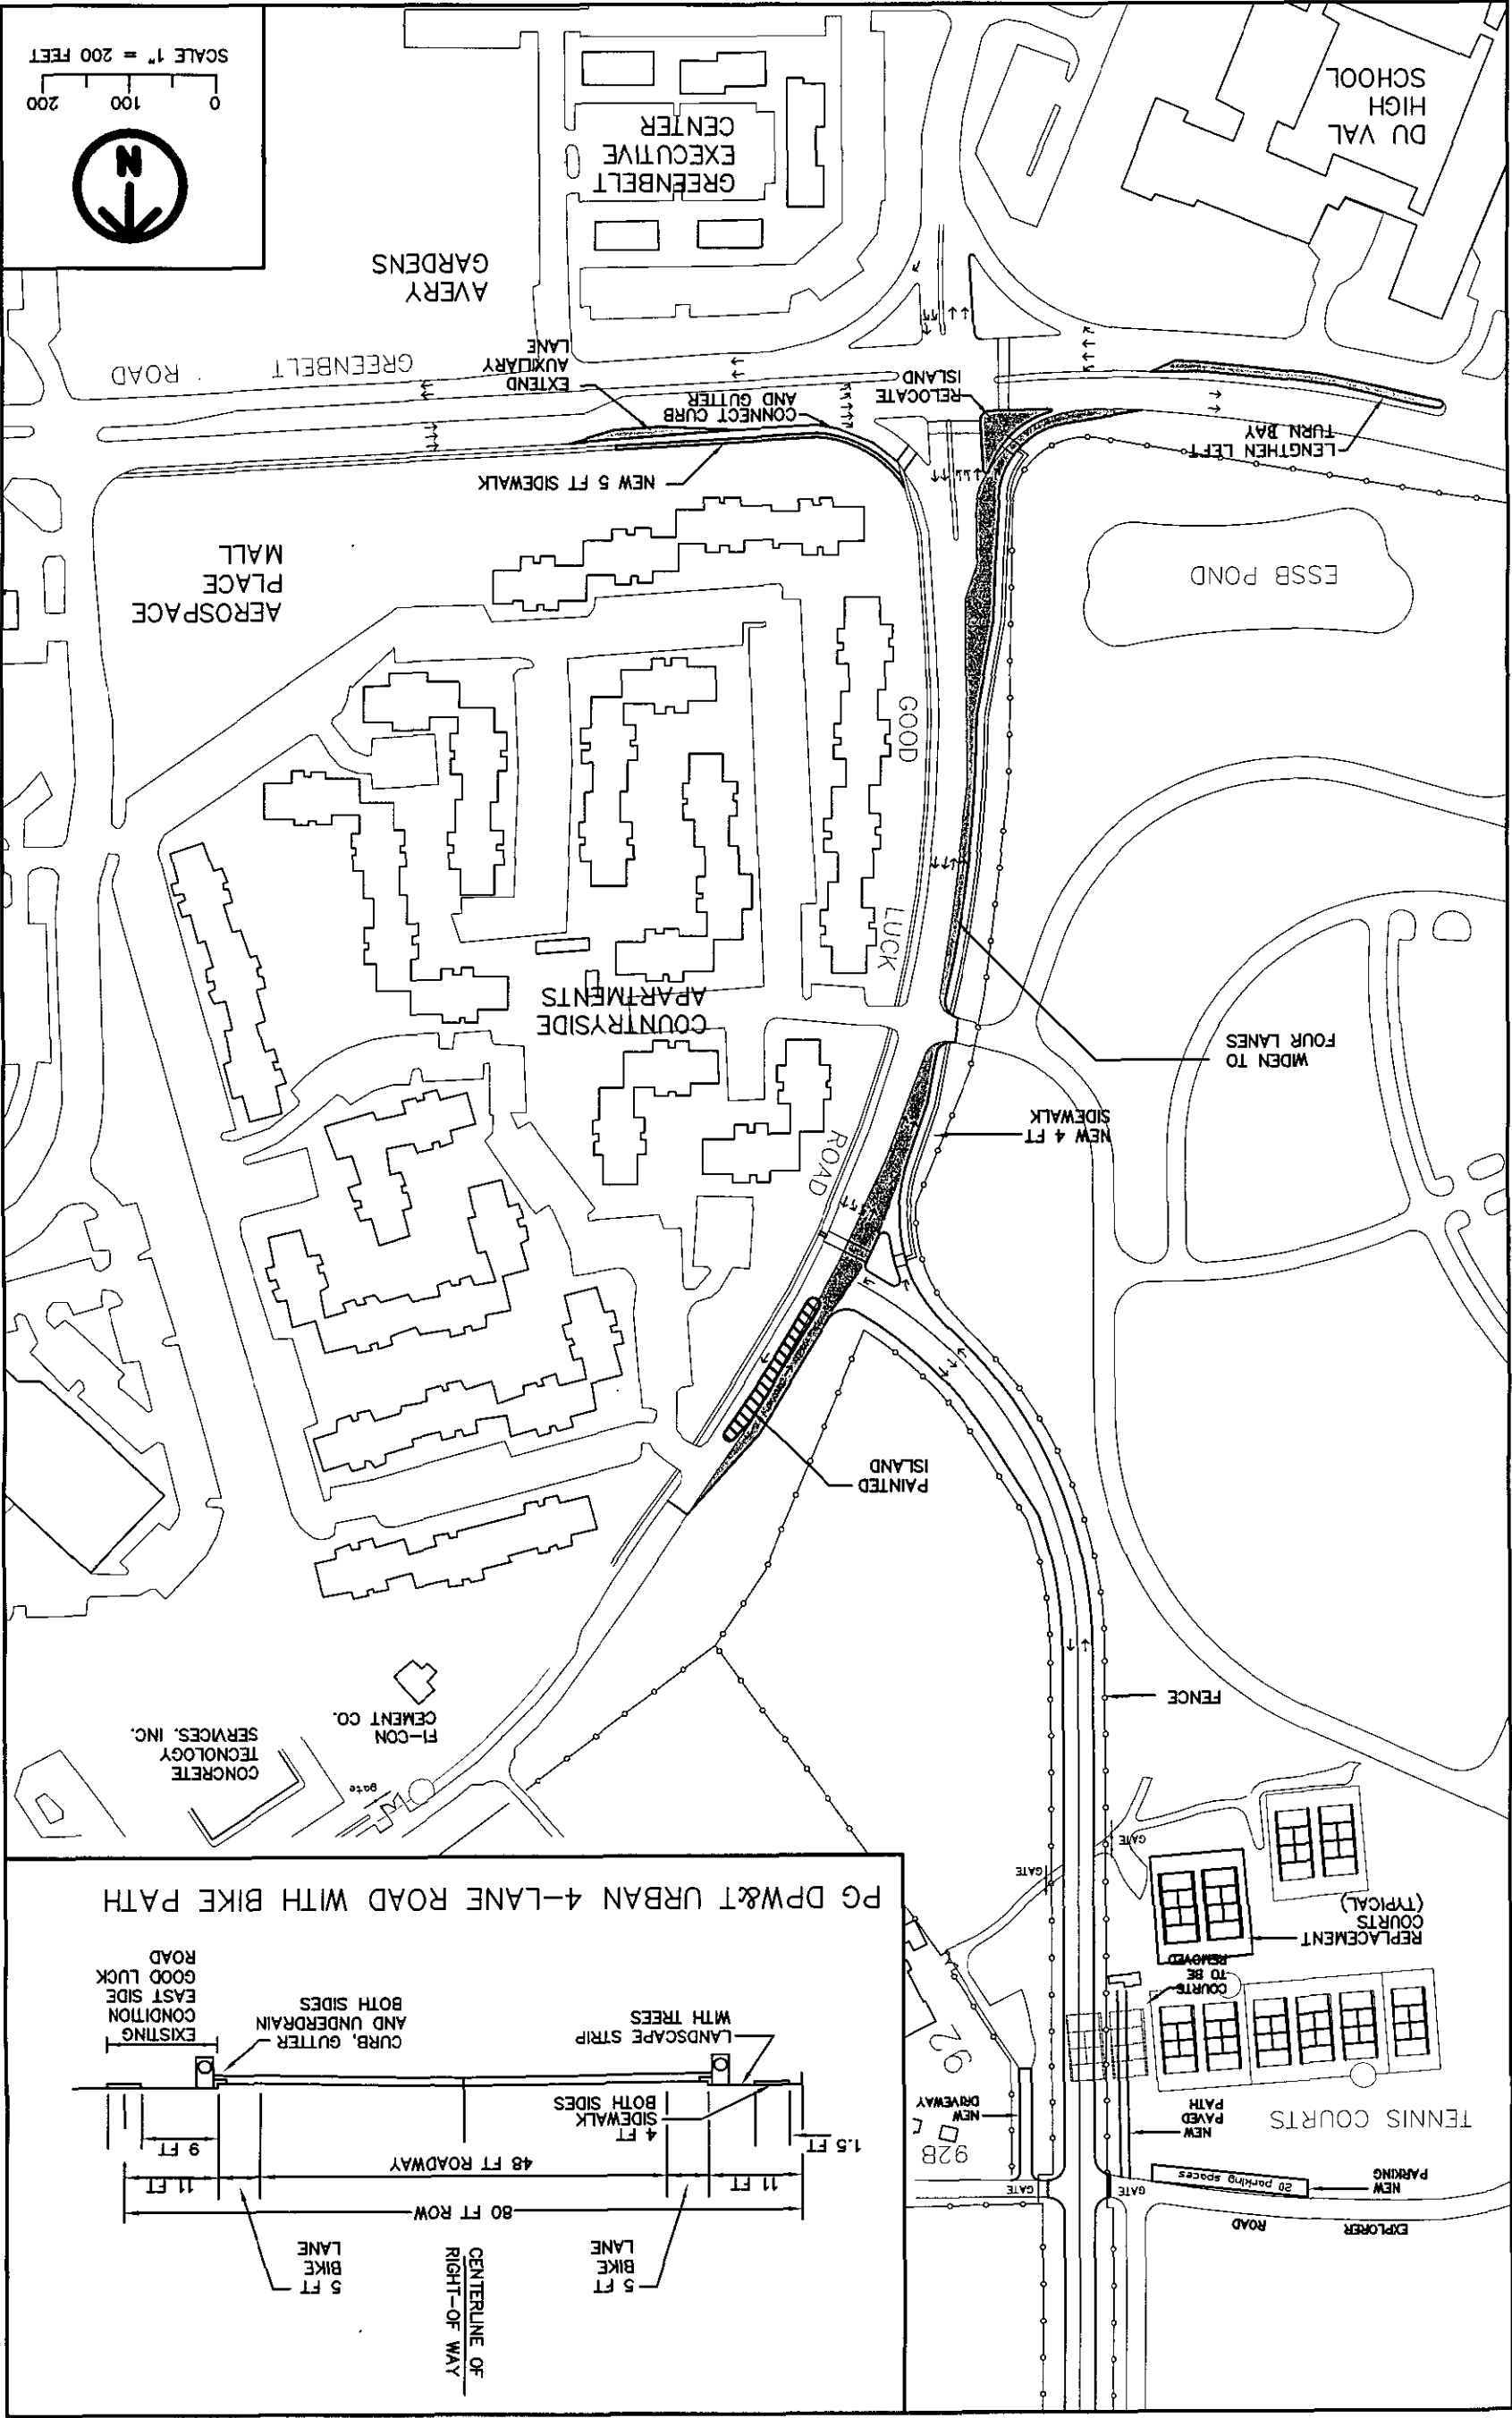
ALTERNATIVE E-1 GOOD LUCK ROAD IMPROVEMENTS.
